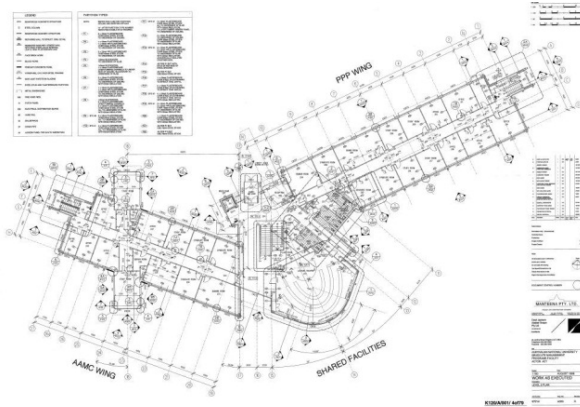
Original layout of the Sir Roland Wilson Building, 1998 (Source: ANU Drawing Office)
